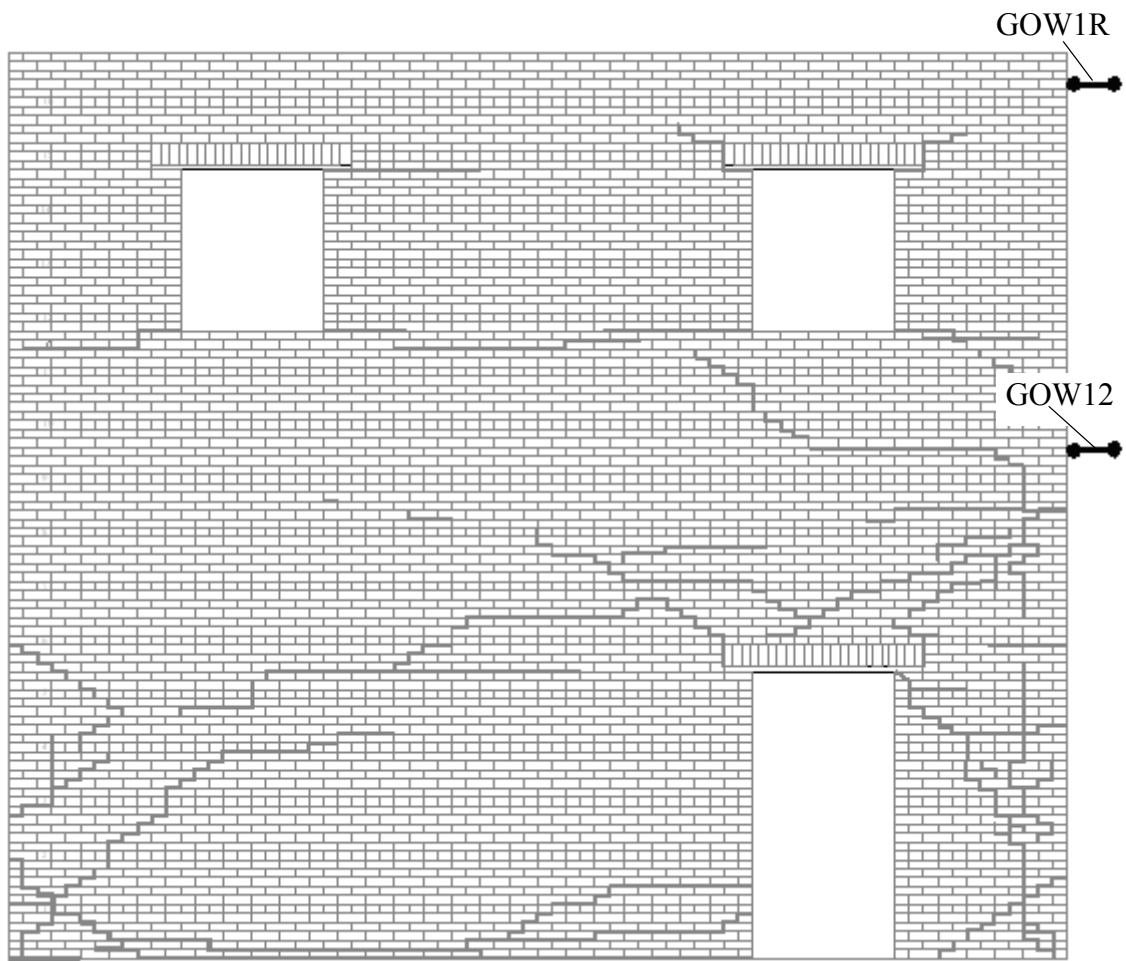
Elevation view of Wall 1 illustrating the location of LVDTs.
